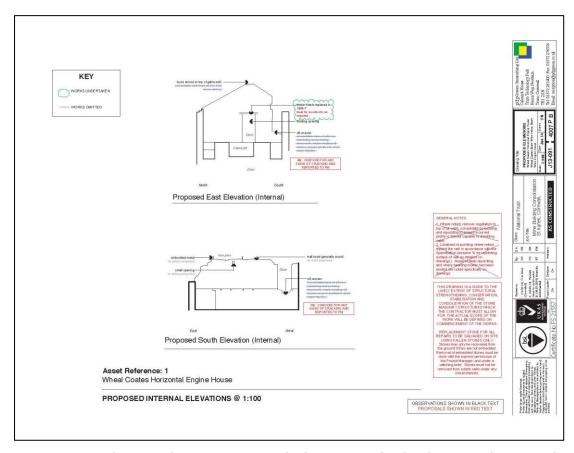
Southern and eastern internal elevations of Wheal Coates horizontal engine house.
